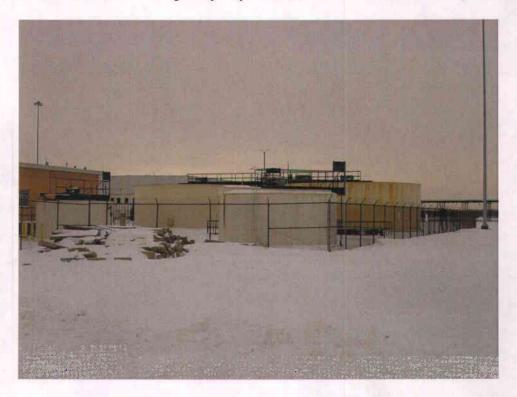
AFP 85: Building 282 (waste treatment facility) and storage tanks.
